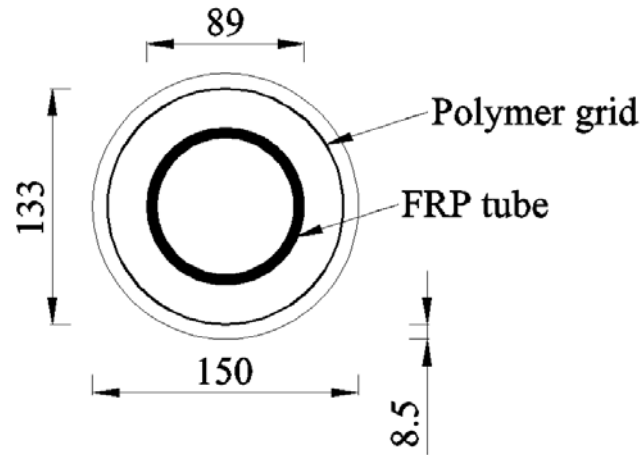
Cross-section view of Type II FTRC specimen (All units in mm)
